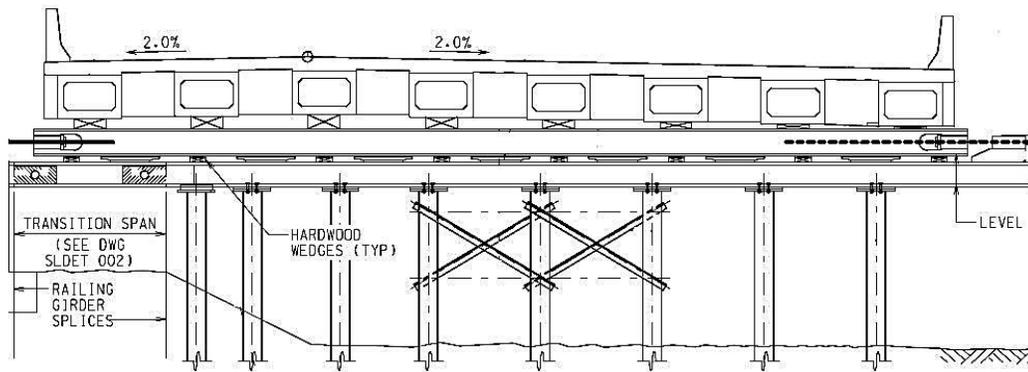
Side view of the US-131 NB bridge temporary substructure
